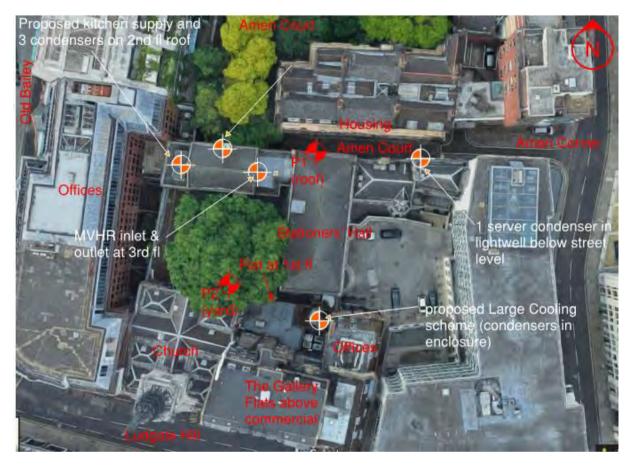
Site Plan – showing the measurement locations (P1 & P2) and residences
